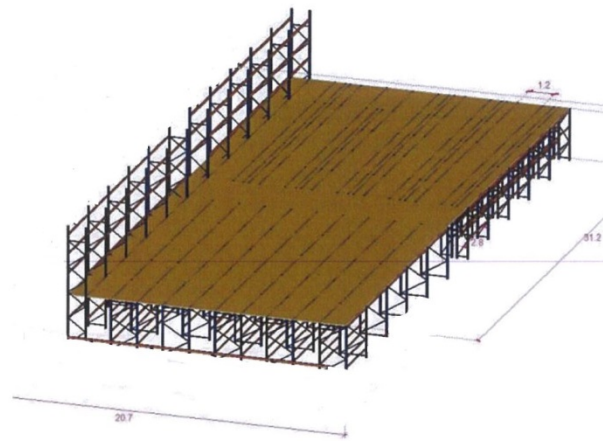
Floor plan of racking system and mezzanine level (not to scale)
